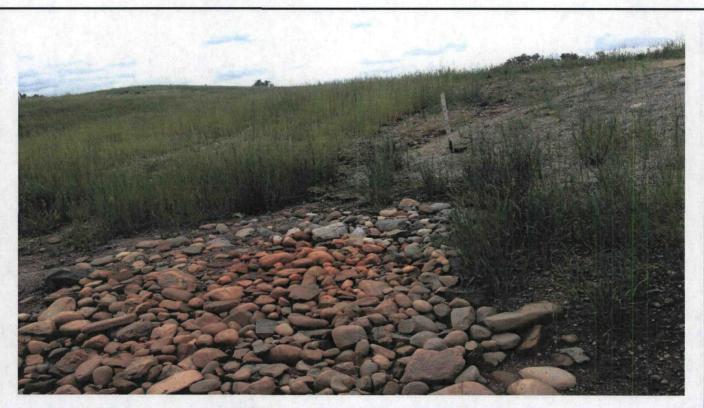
Photo shows erosion on the slope above the rip rap at the outlet of the south pore water discharge pipe.
